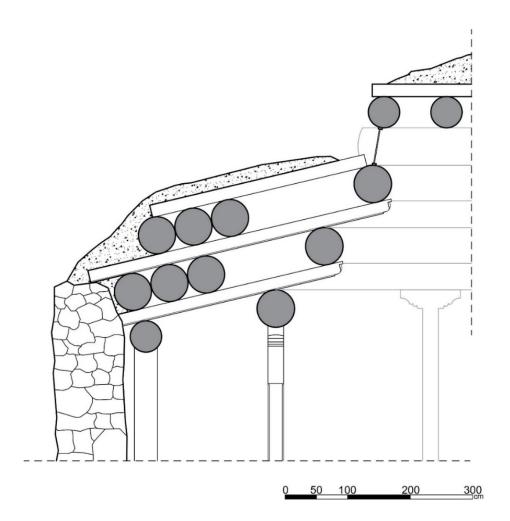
Schematic section drawing of merek's east wall. (Prepared by Author, 2019)
